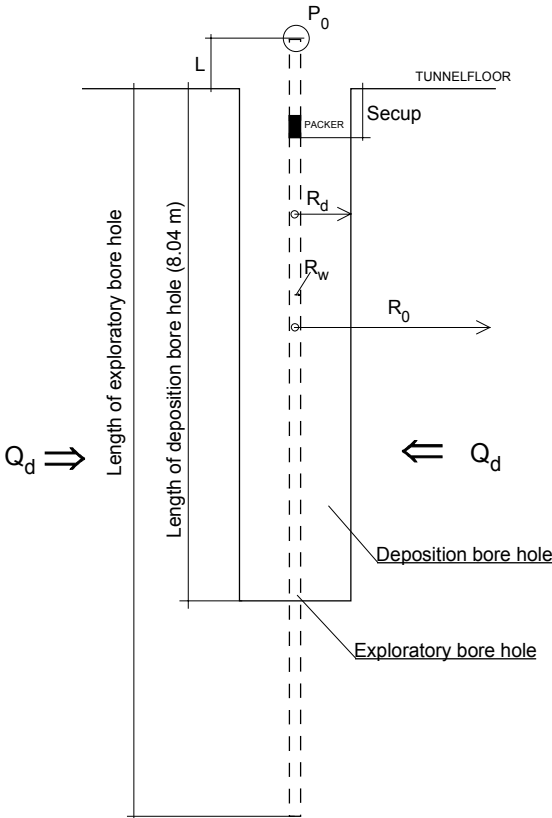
Schematic layout of deposition bore hole and exploratory borehole.
